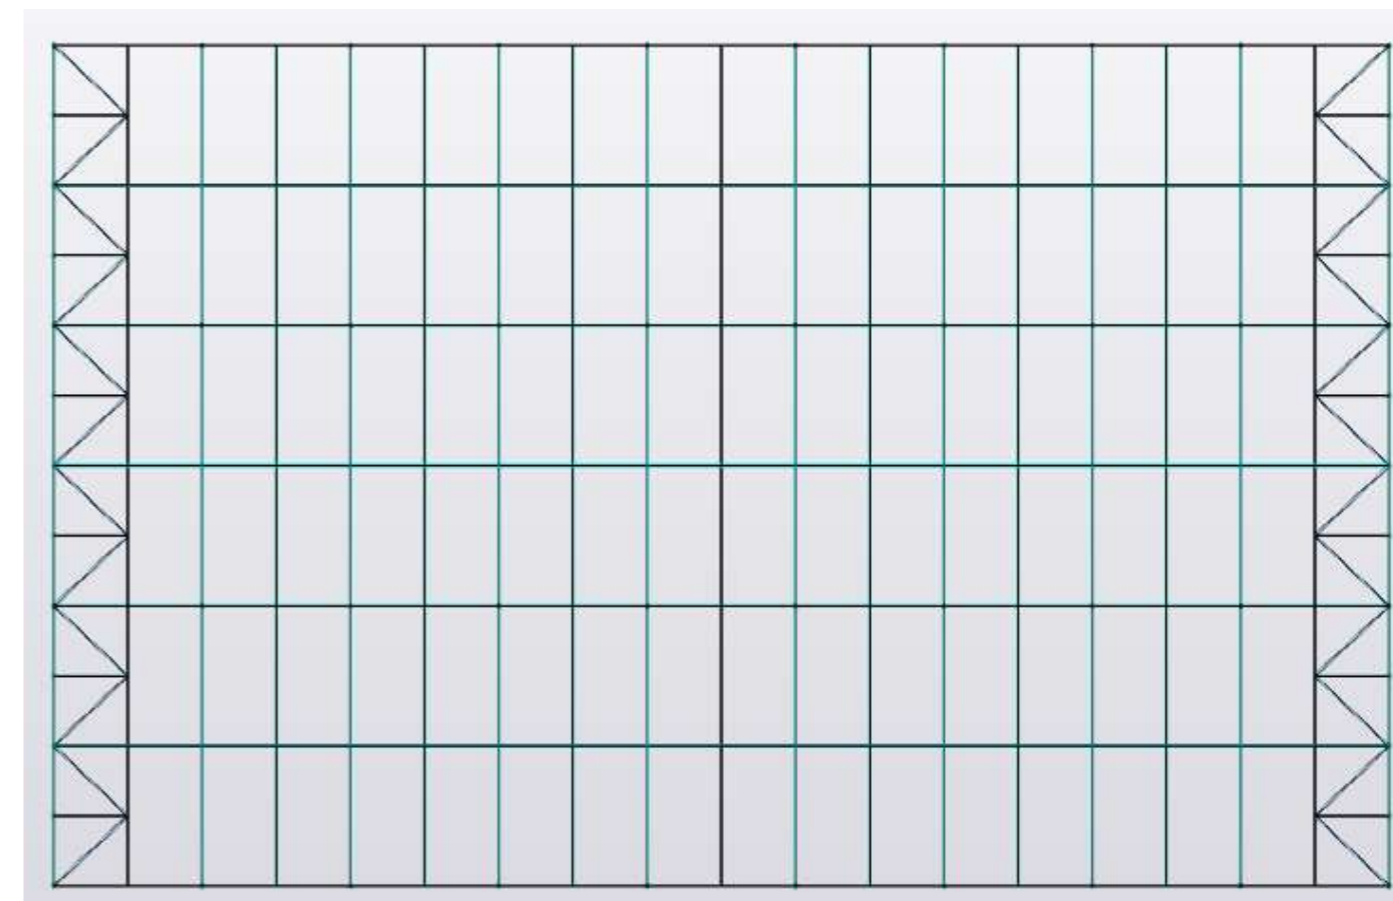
Typical Plan View of Roof Bracing (Portal Frames at 13.585m Centres)
